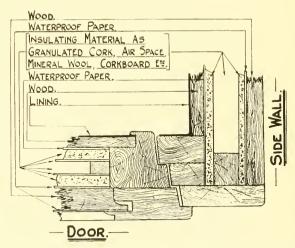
TYPICAL REFRIGERATOR WALL AND DOOR CONSTRUCTION
